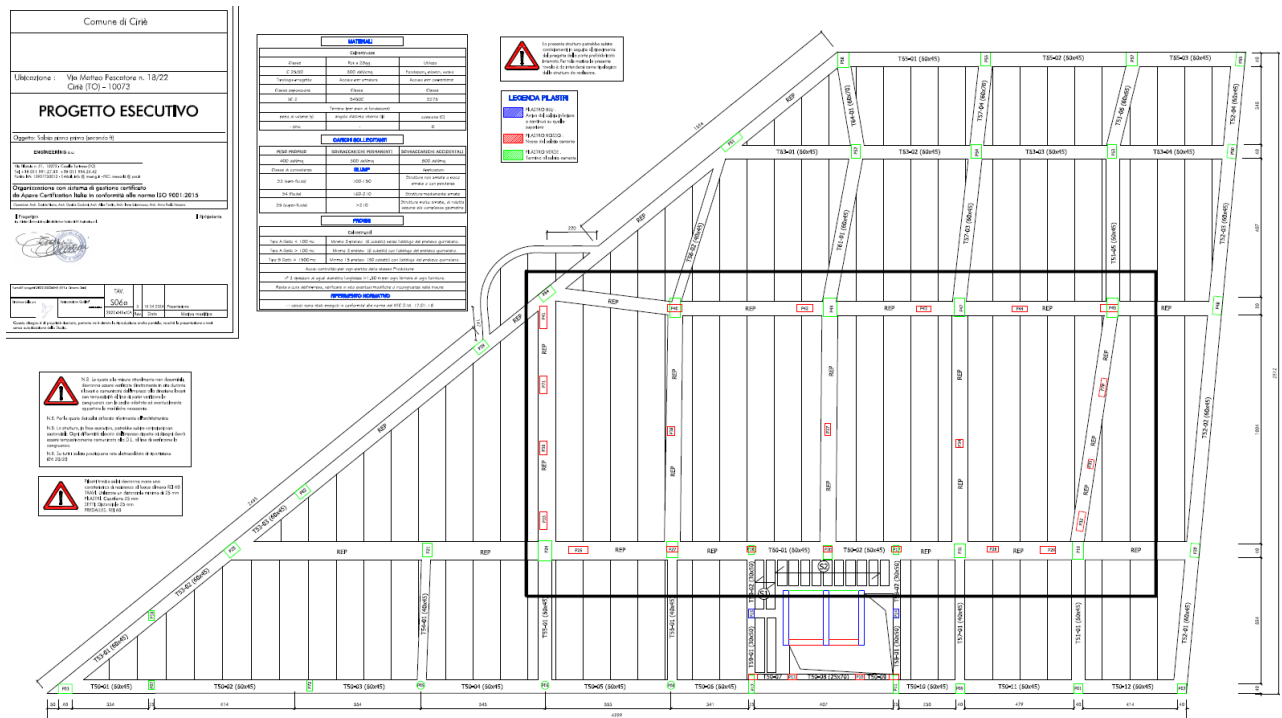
Structural design plan of “1st floor” to highlight the portion considered in the example in Figure 120.
